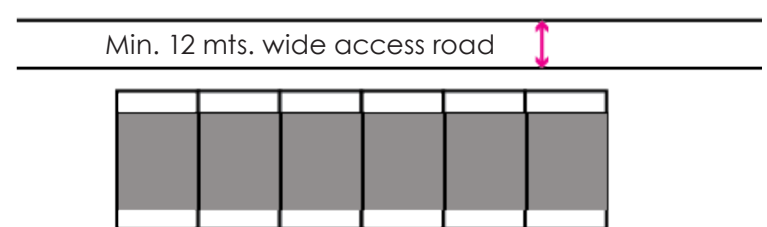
Min. 12 mts. wide internal roads to plotted housing
